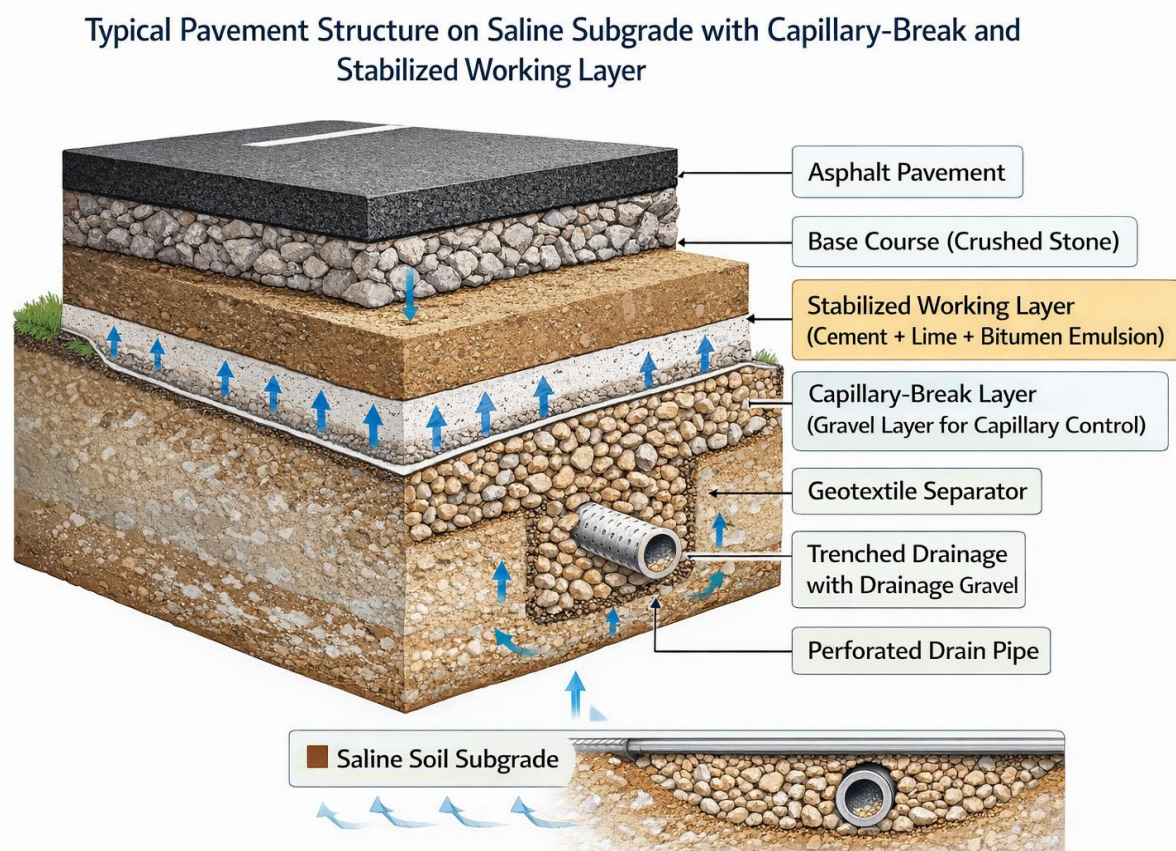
Typical pavement structure on saline subgrade with a capillary-break and stabilized working layer.
